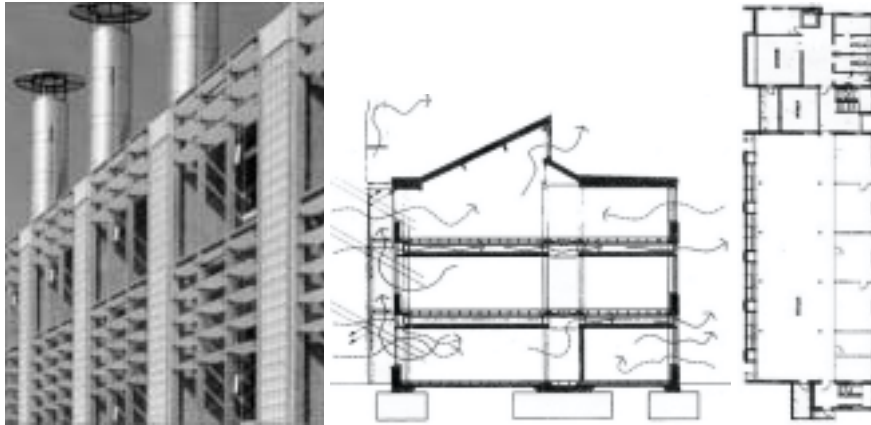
The eye-catching element of The Environmental Building at BRE is the five ventilation chimneys which accentuates the building's south façade as well as its silhouette (*left*). Drawing of the section (*middle*) and drawing of the plan (*right*).
